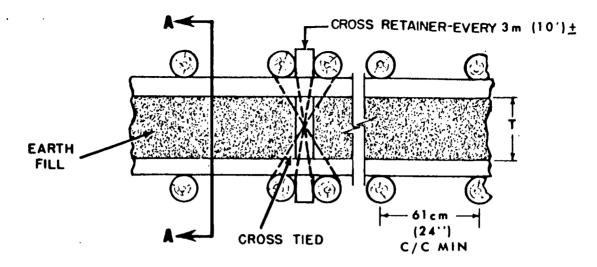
Dimensioned timber constructed bulkhead revetment.
